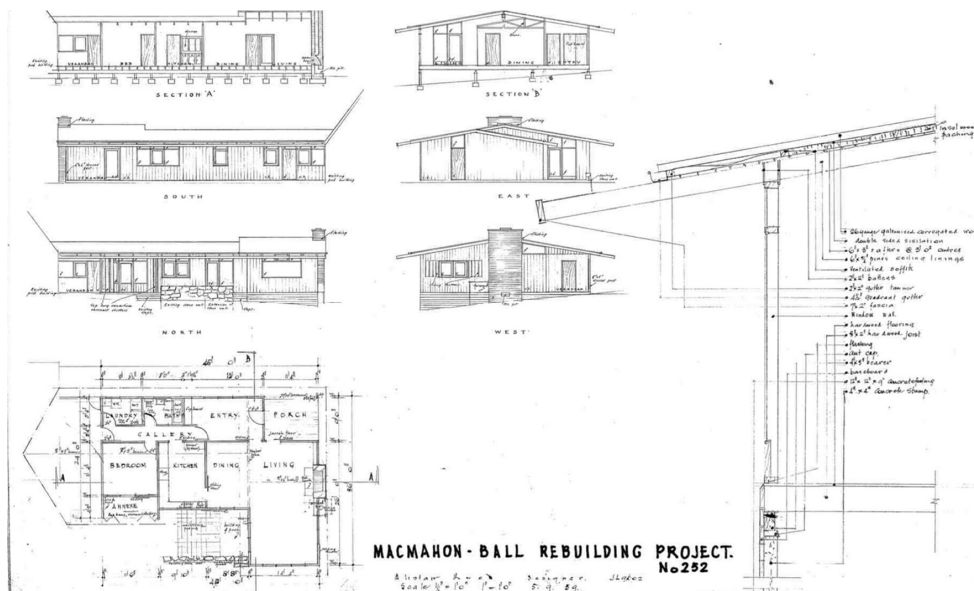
The Knox plan for the Ball rebuilding project, 1959. (Source: A Knox 5 September 1959, Job No 252, Alistair Knox Foundation).
